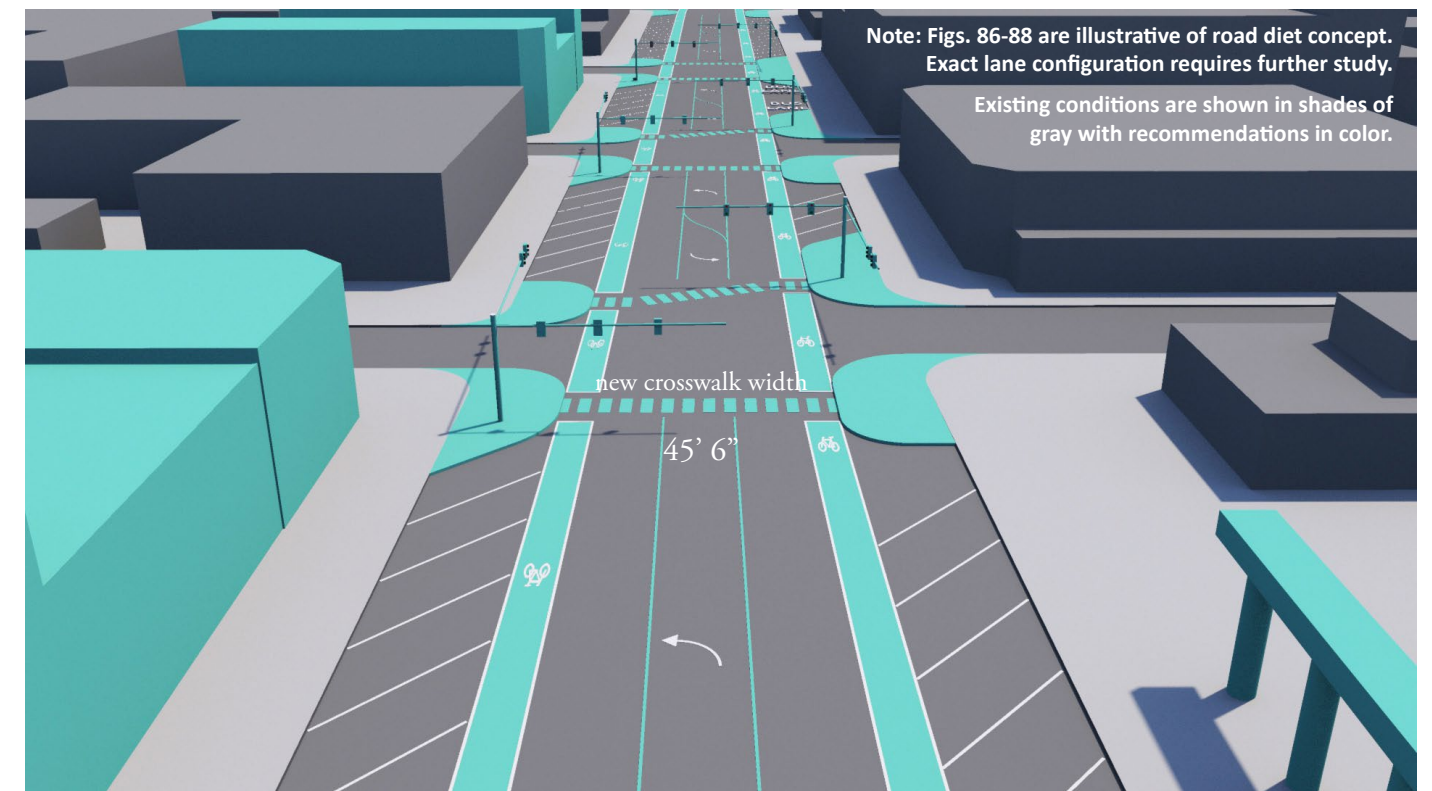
Road Diet 2: Douglas Ave. West of Bridge
